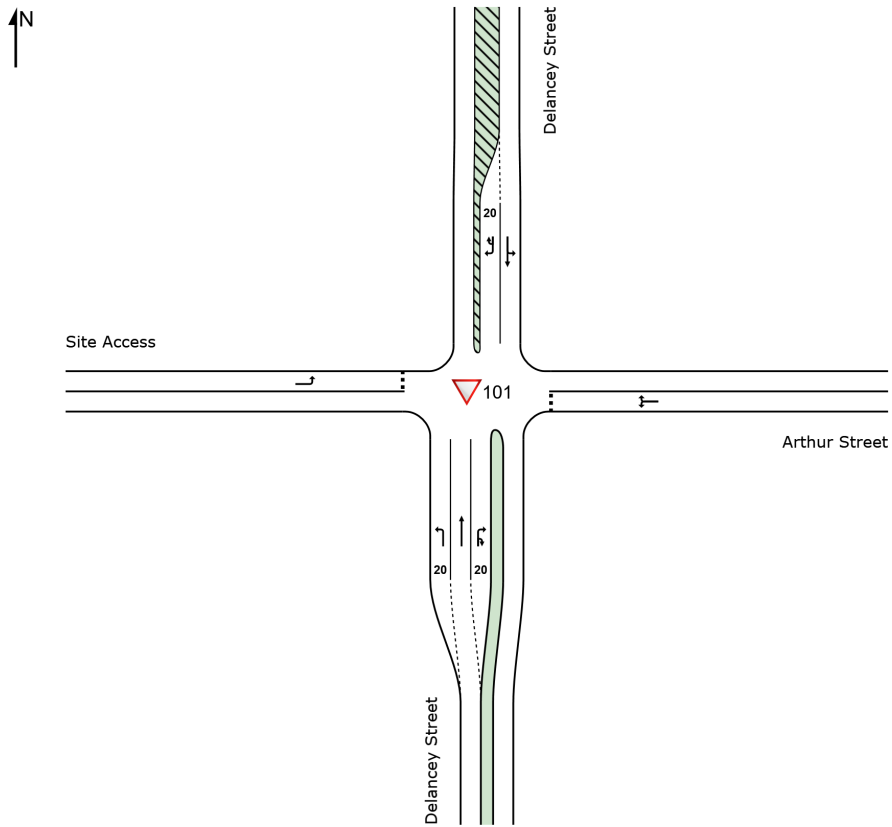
Delancey Street / Site Access / Arthur Street Intersection Layout
